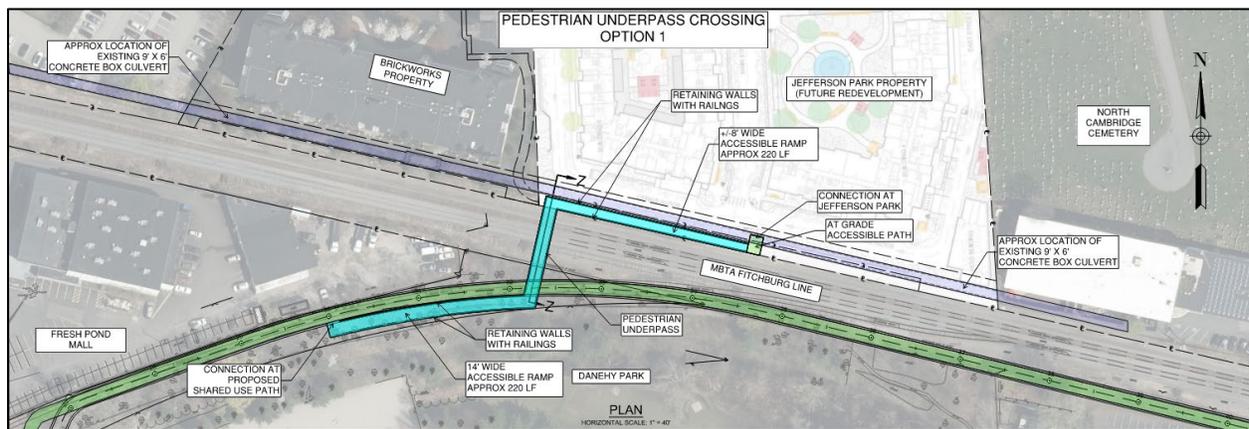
Pedestrian & Bicycle Under Crossing Concept 1 - Plan Diagram
